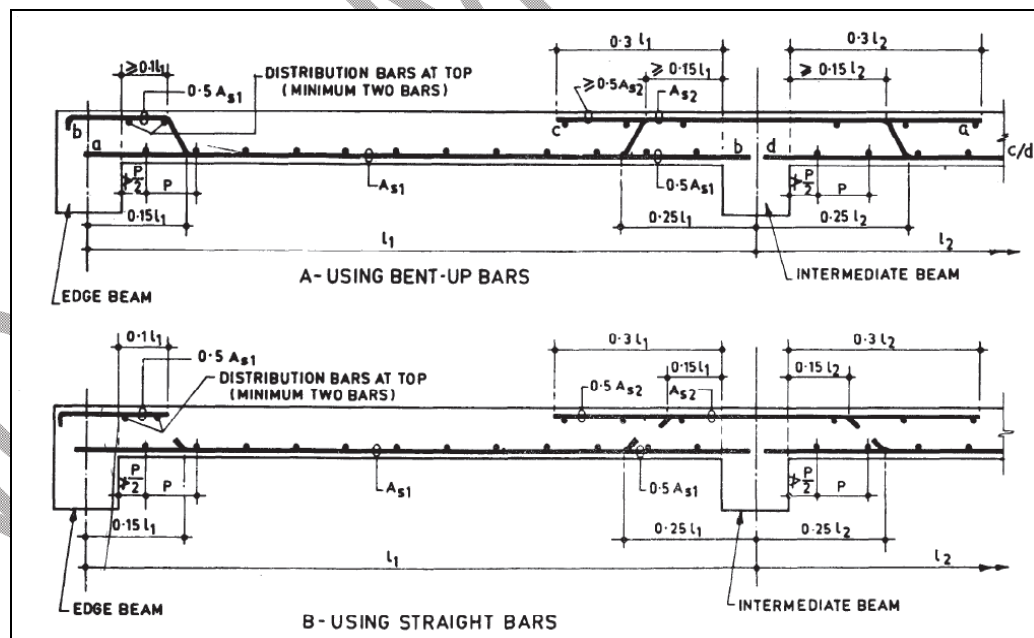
Simplified Curtailment Rules for continuous slab
